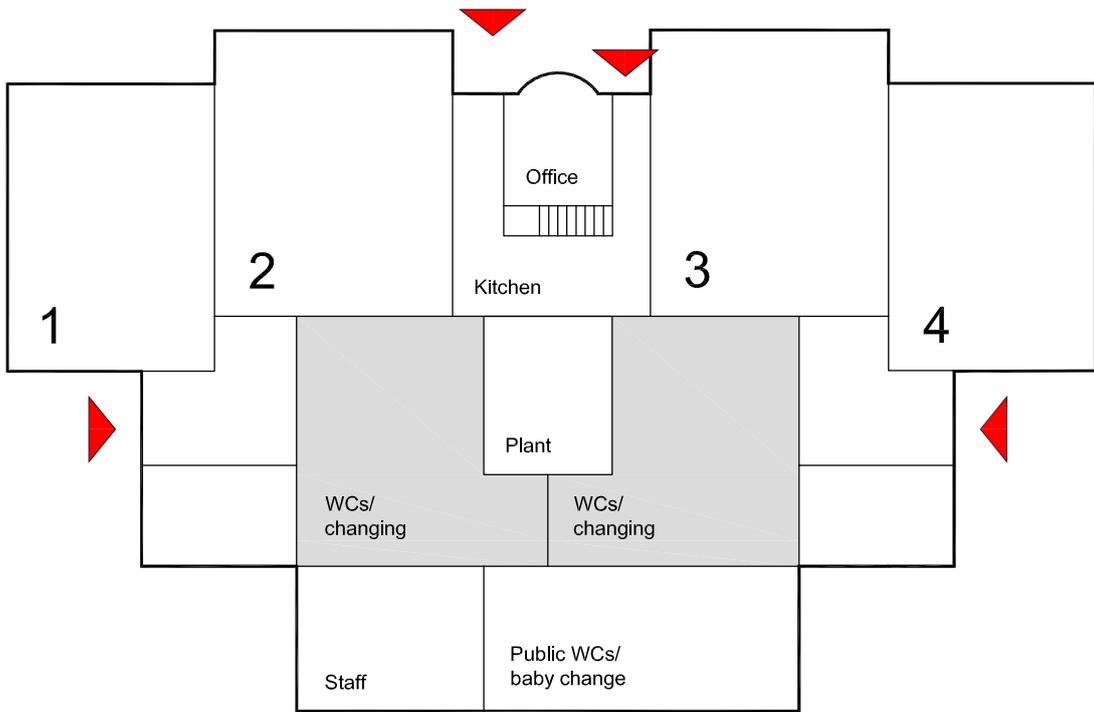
Bowls Pavilion Block Plans - Upper ground floor
